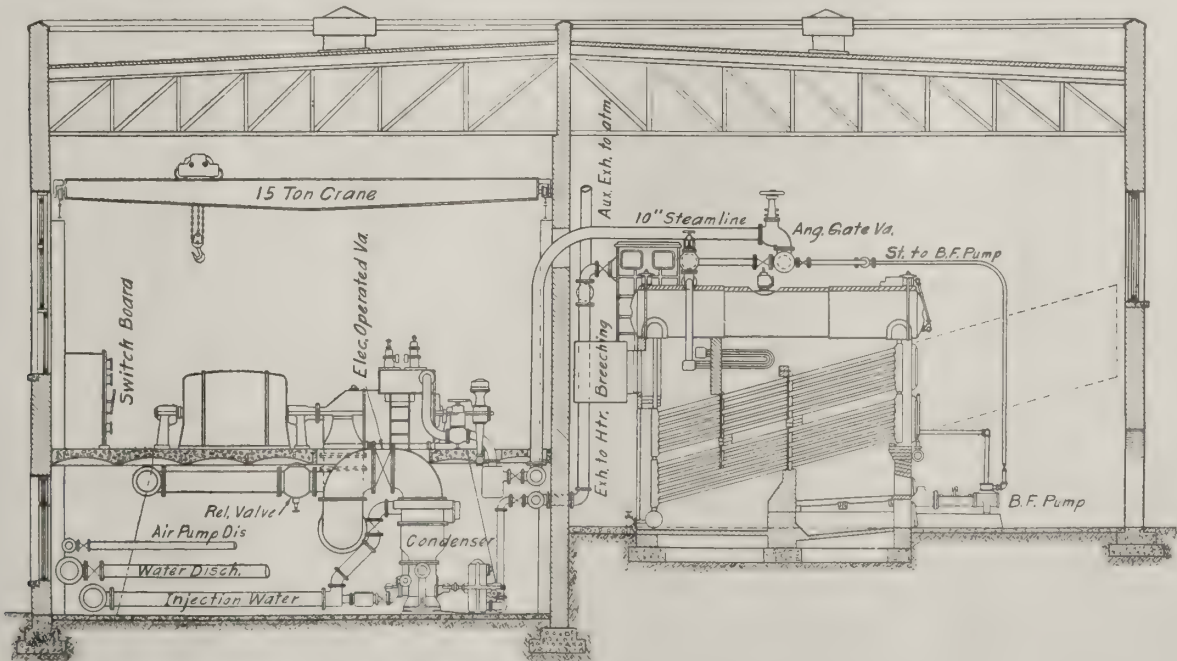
ELEVATION OF STATION UNDER DISCUSSION.
